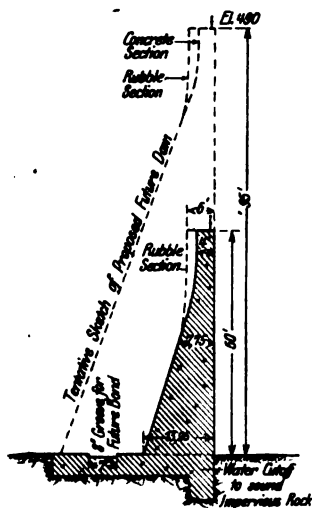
Section through Crown of present 50-Ft. and proposed 95-Ft. Las Vegas Arched Dam.
